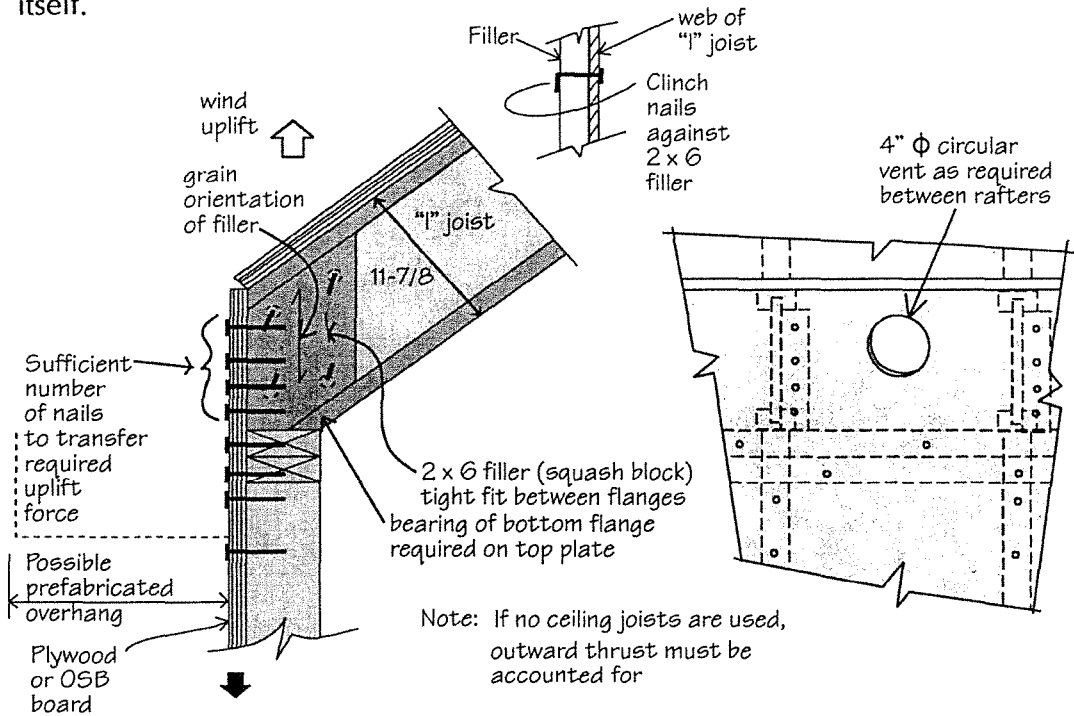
Roof to Wall Detail (cathedral ceiling)
